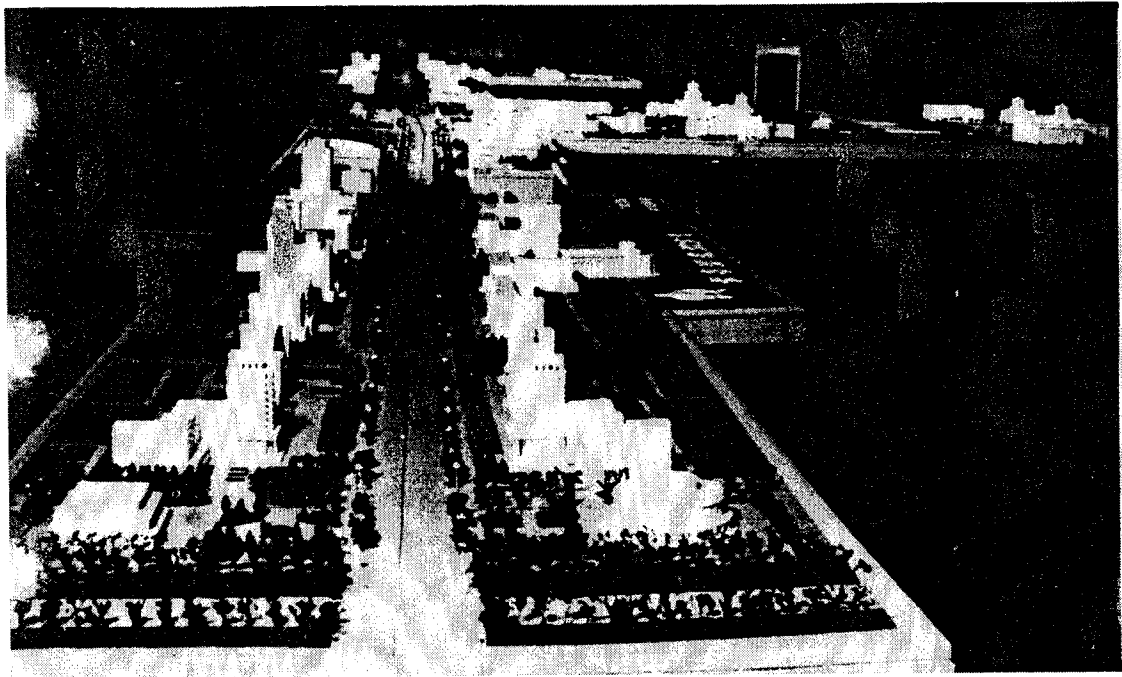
Chang'an Avenue Plan, Beijing City Planning Bureau Design Institute, 1964.4
